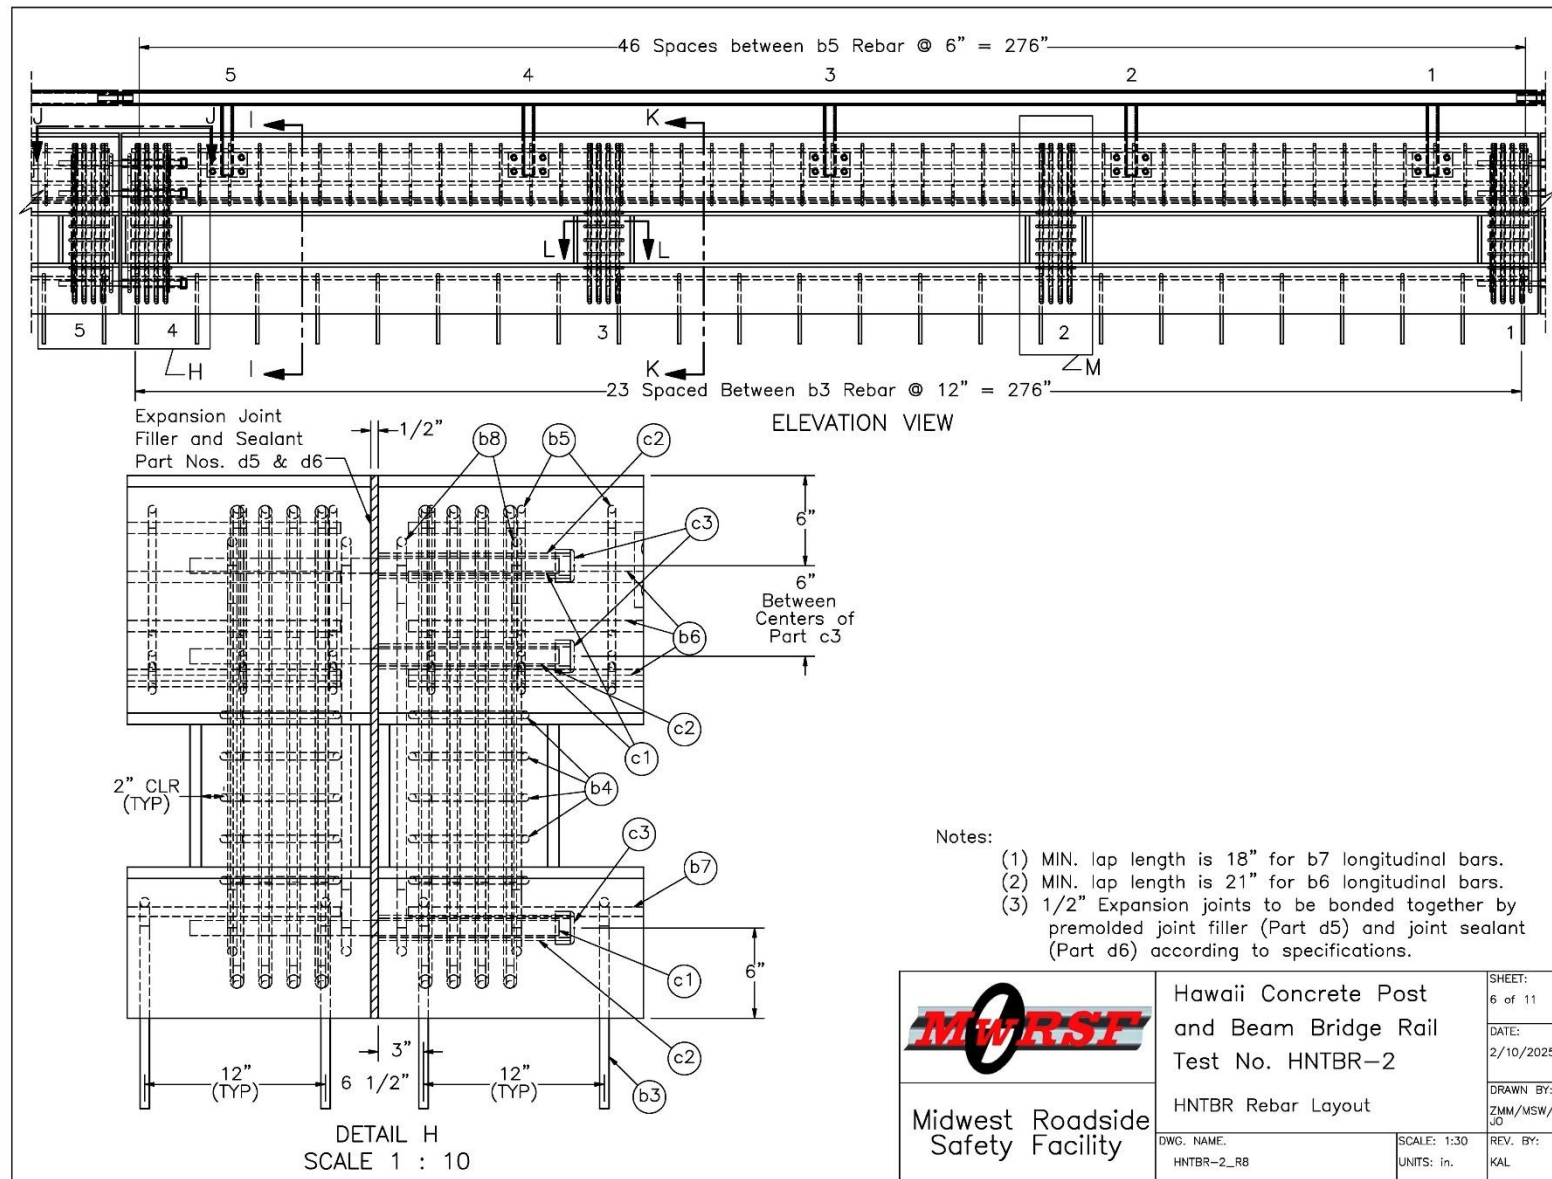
Rails Rebar Detail, Test Nos. HNTBR-2 and HNTBR-3
